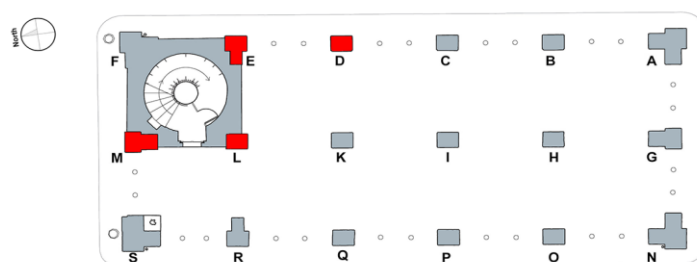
Plan of the ground floor. In order to strengthen the tower, the supporting arches at the ground floor were infilled and columns D, E, L and M were rebuilt.
